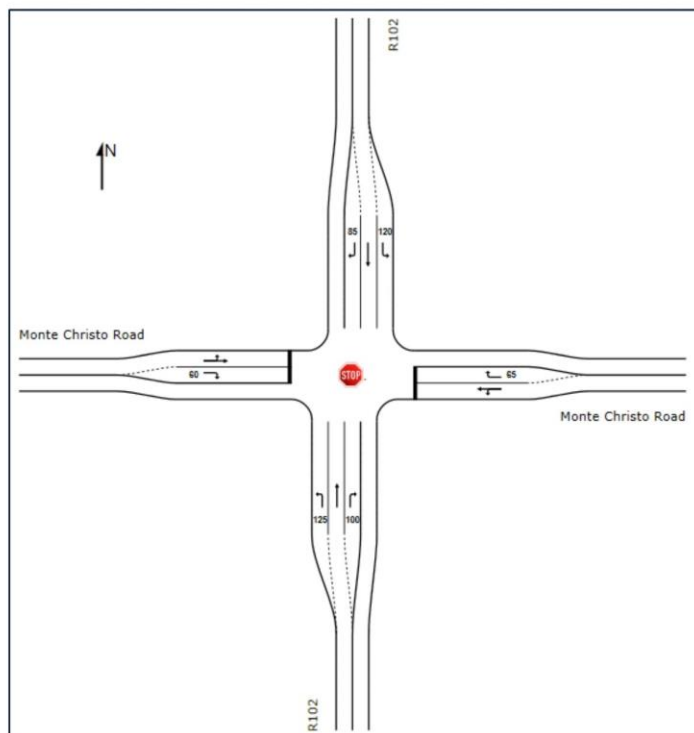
R102 and Monte Christo Road Existing Intersection
